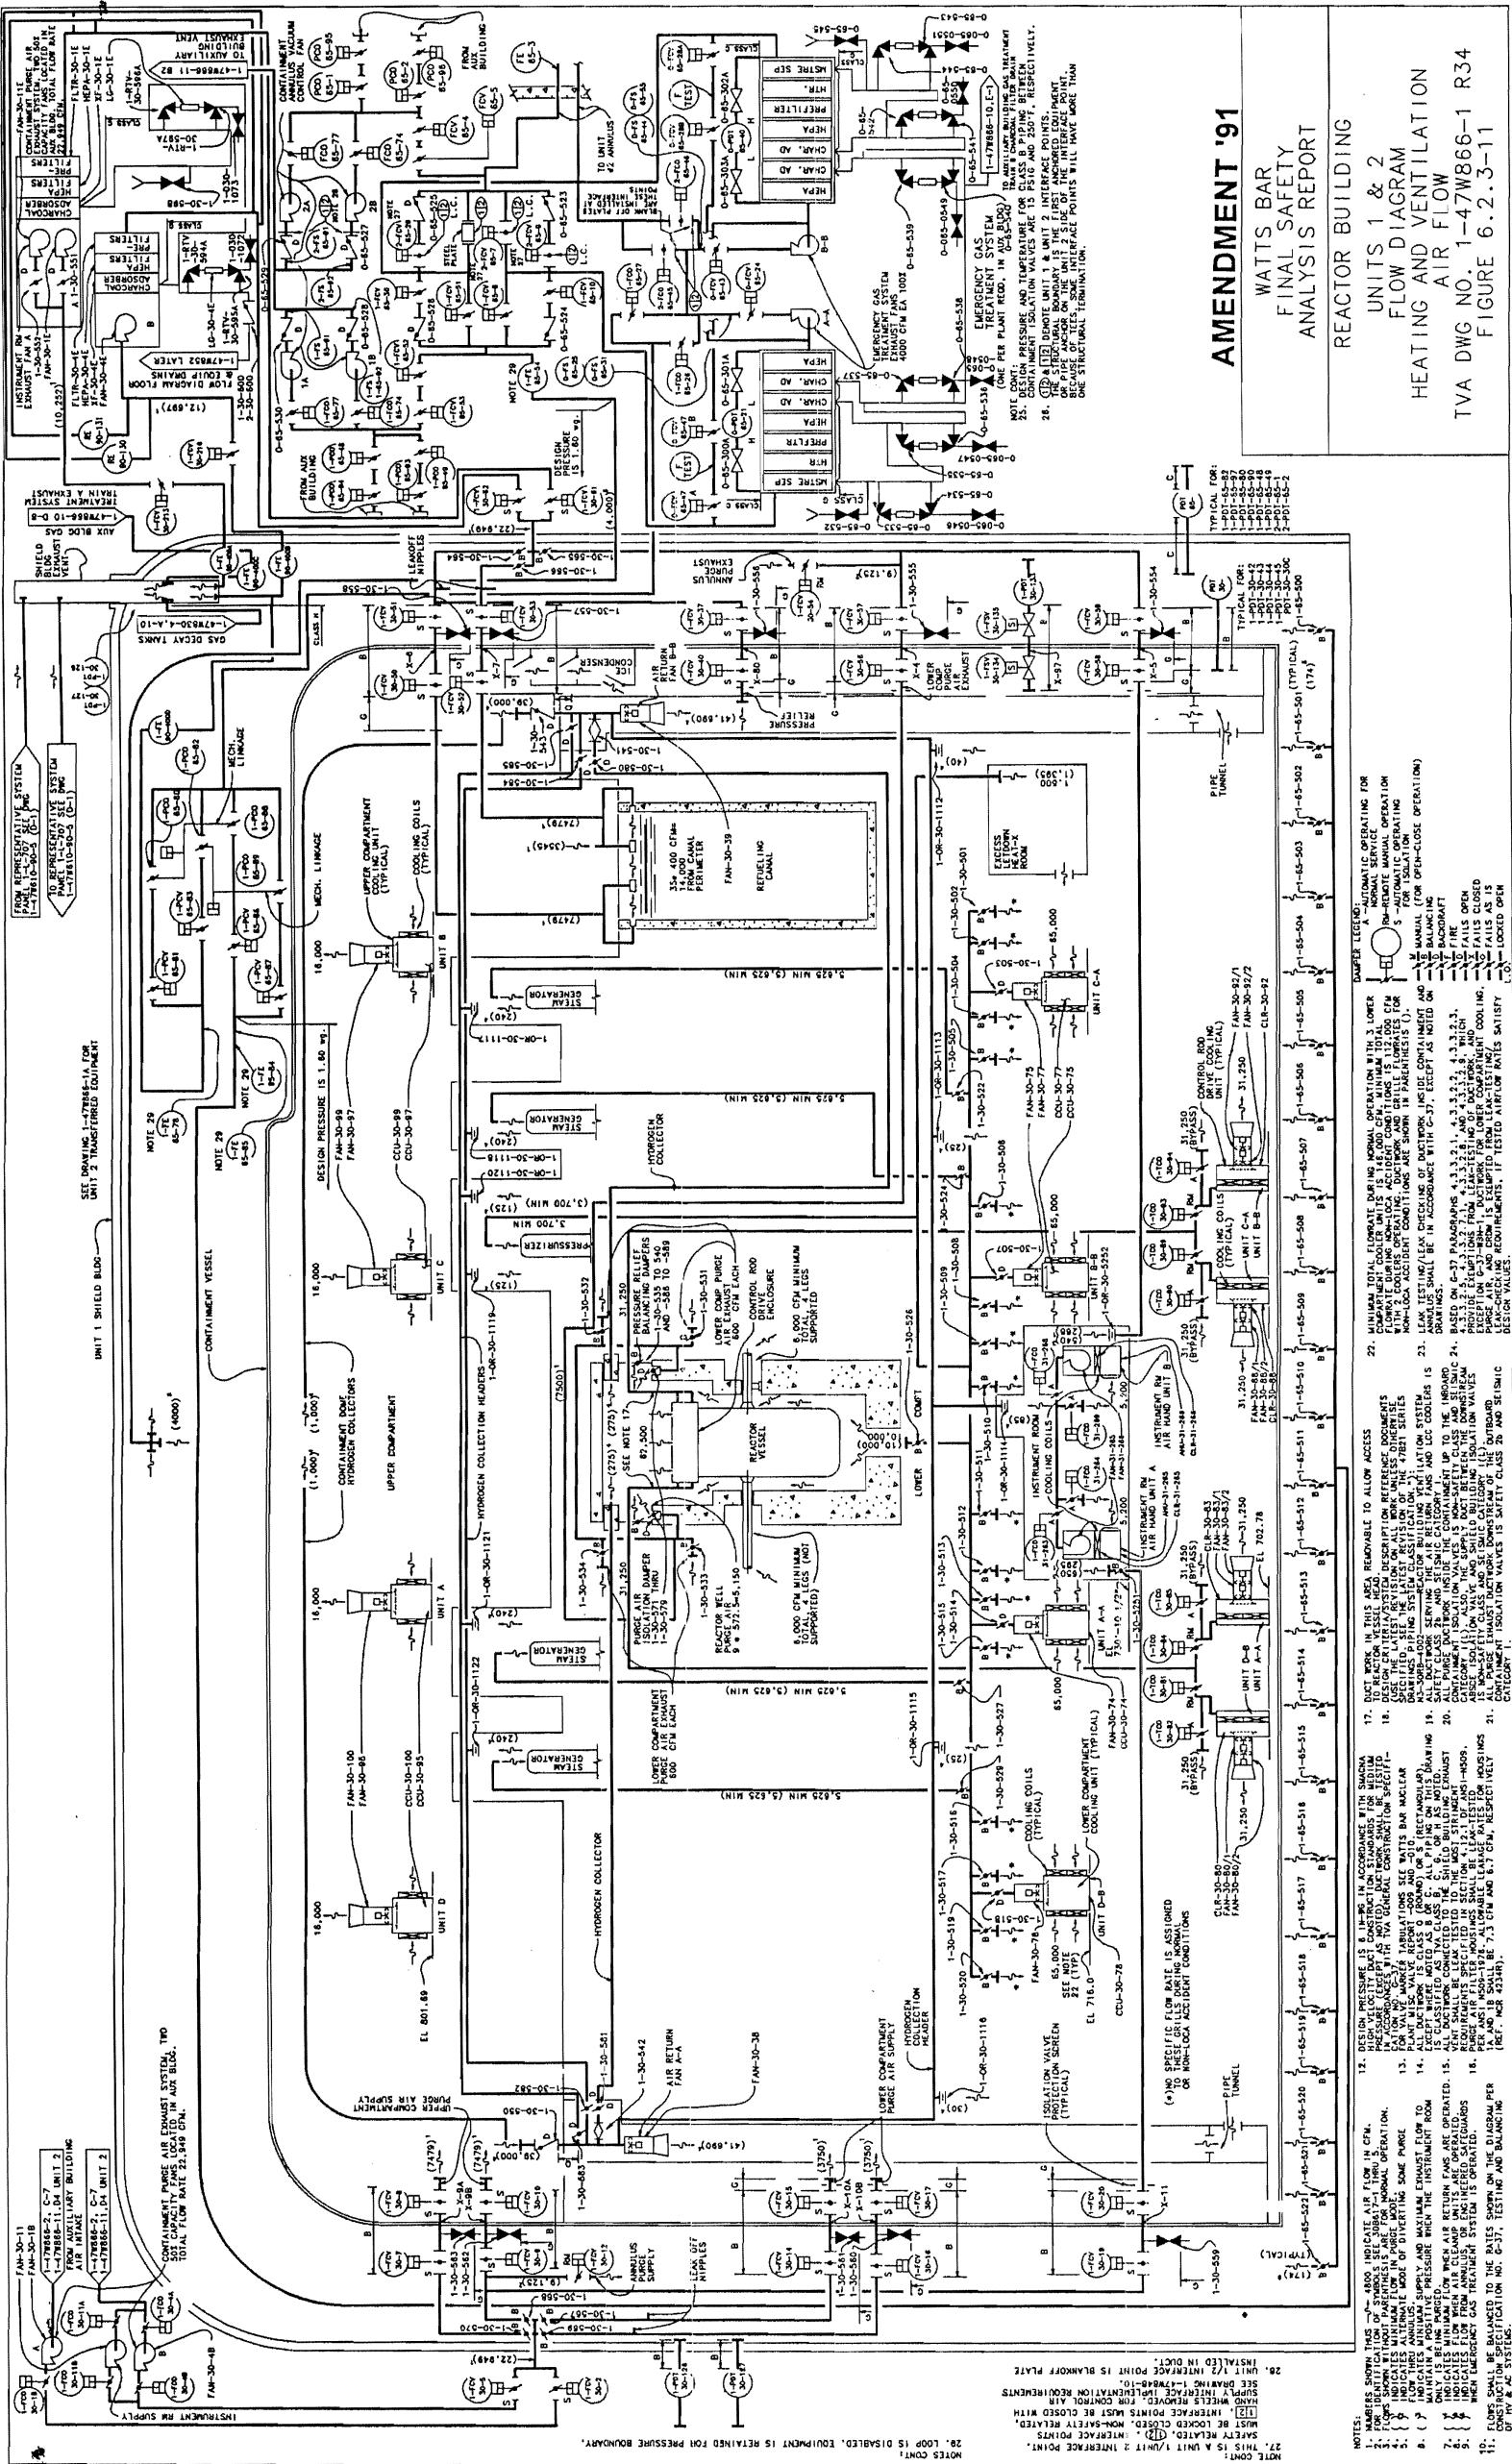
Reactor Building - Heating and Ventilation Air Flow
